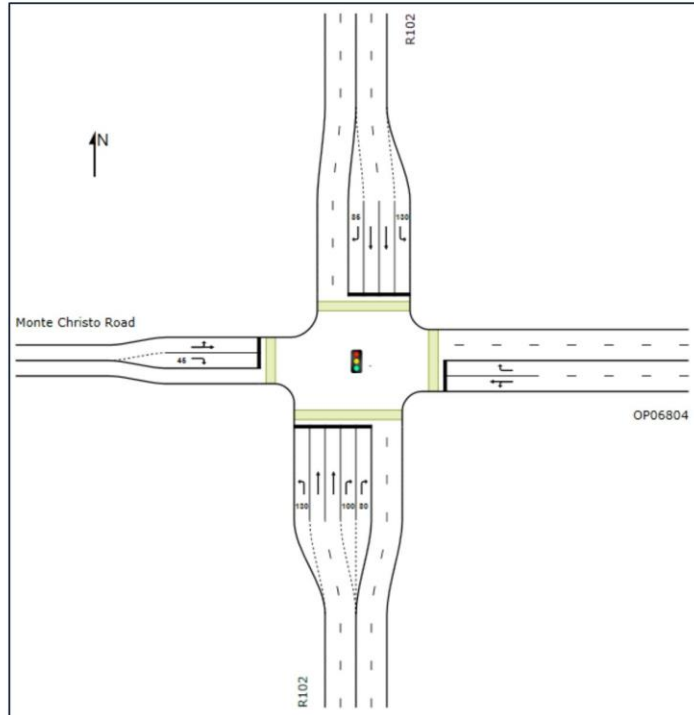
R102 and Monte Christo Road Proposed Intersection
